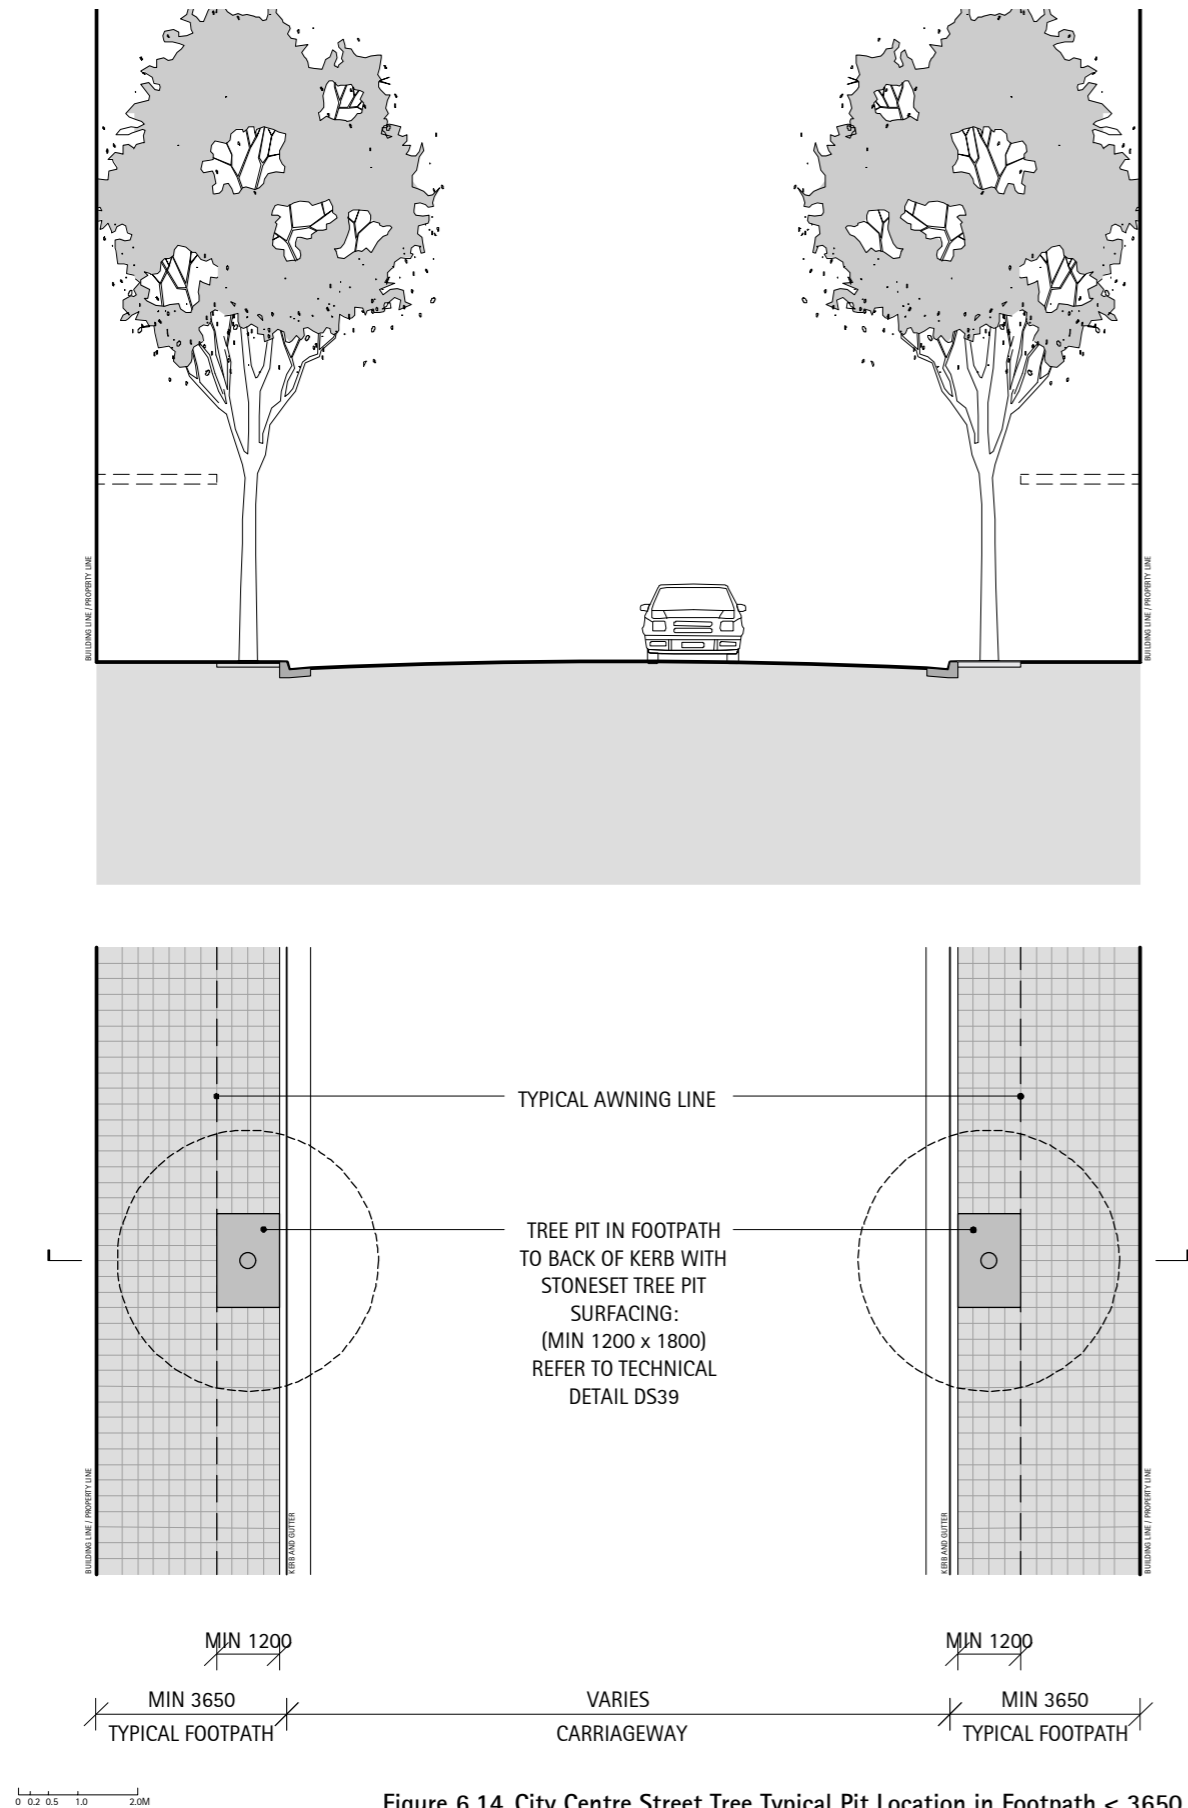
City Centre Street Tree Typical Pit Location in Footpath < 3650
